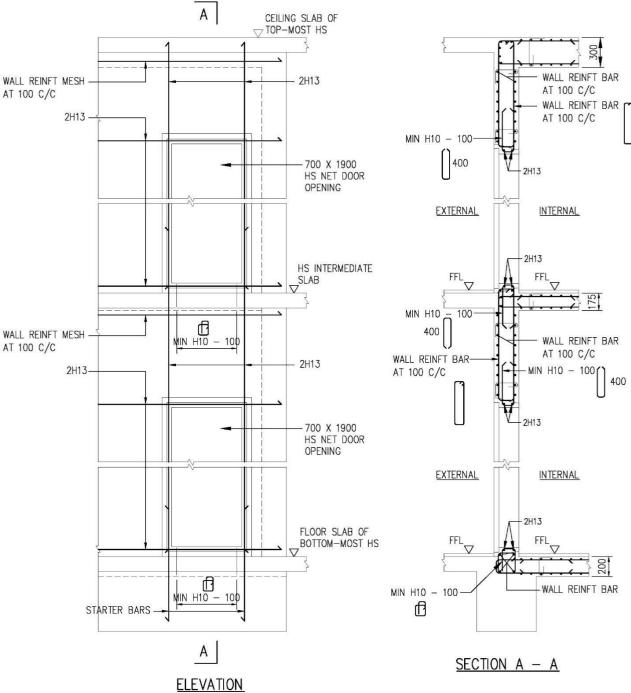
(e) SECTIONAL DETAILS OF TWO HS WITH AN INTERNAL COMMON WALL
